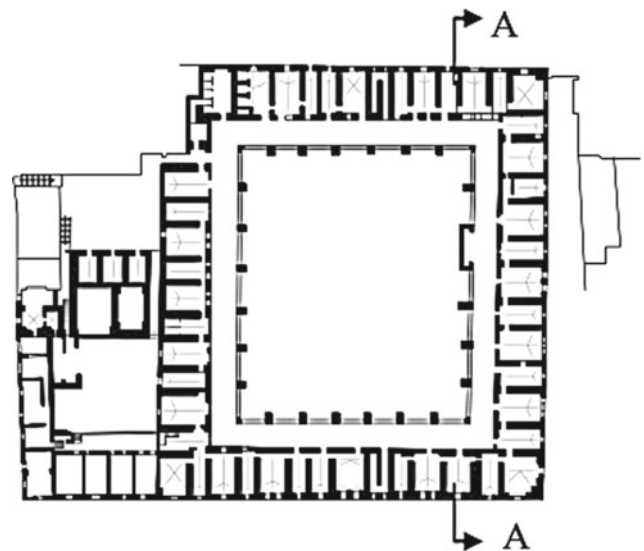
Ground floor plan of Khan Al faring. *Source* Fouad (2018)
